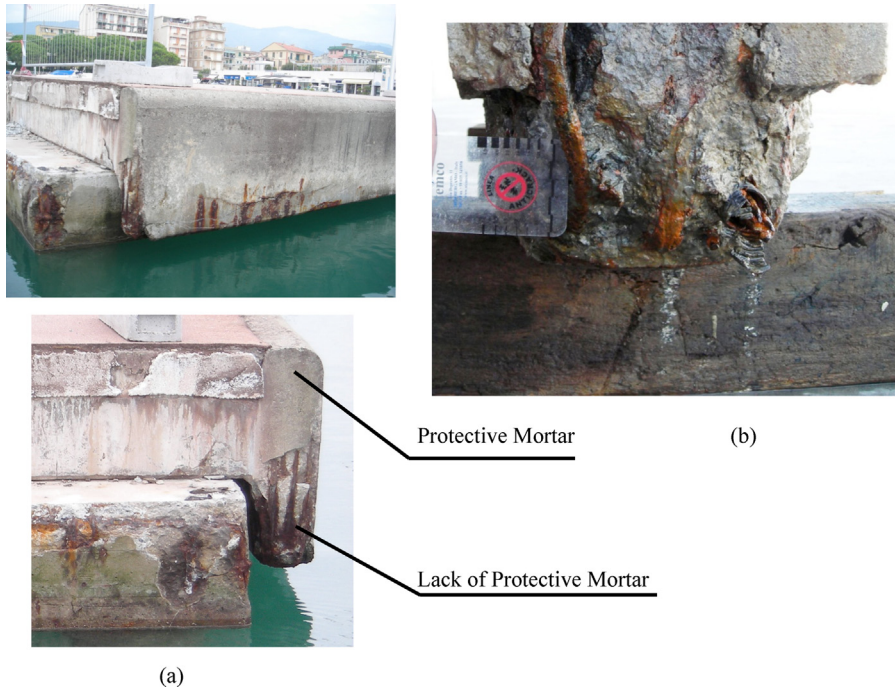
Spalling of the protective mortar (a) exposes the prestressed cable ducts to weathering. In (b) the sea water comes out from the duct of the recovered collapsed jetty.
